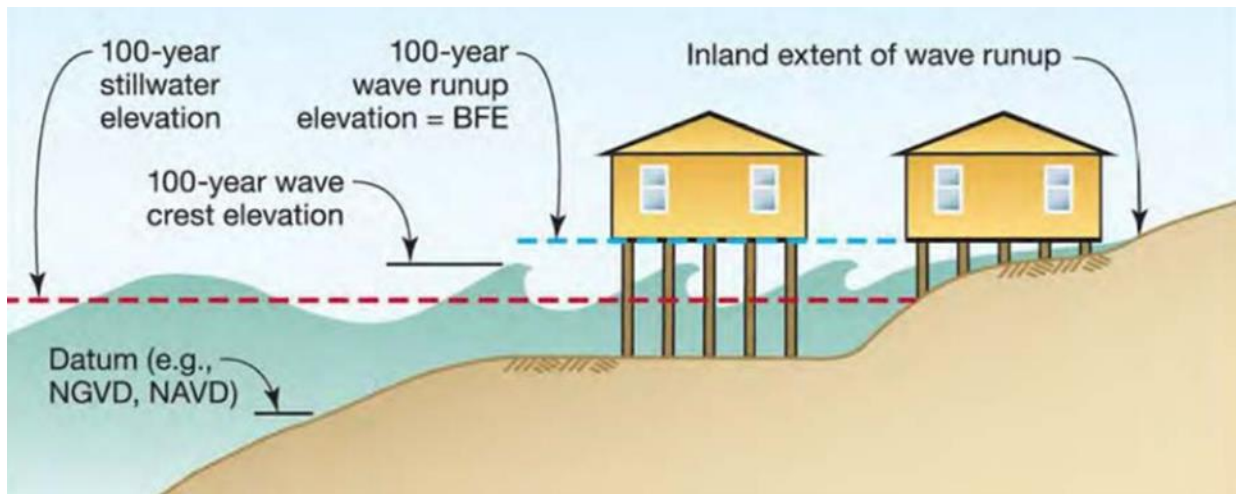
Determining building first floor elevation based on wave conditions (source: FEMA Coastal Construction Manual 2011)
